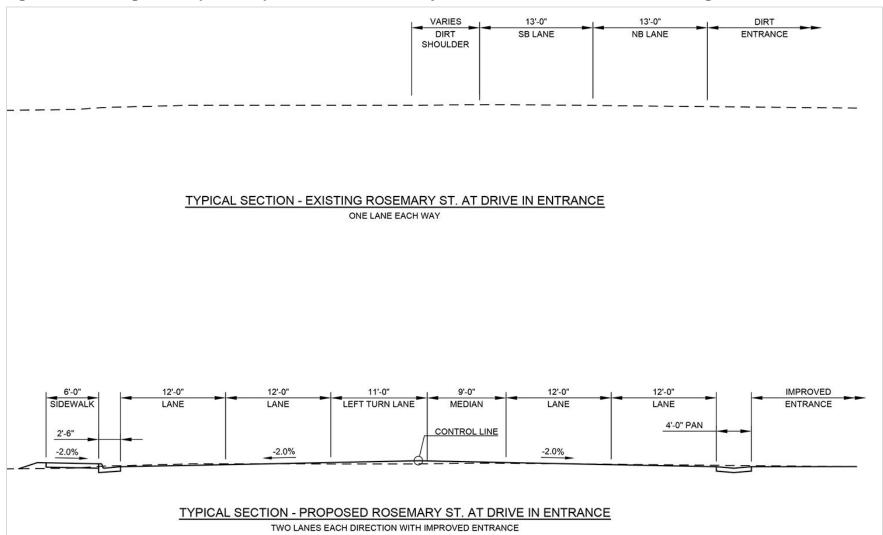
Existing and Proposed Improvements to Rosemary Street at 88 Drive-In Entrance, Looking North
